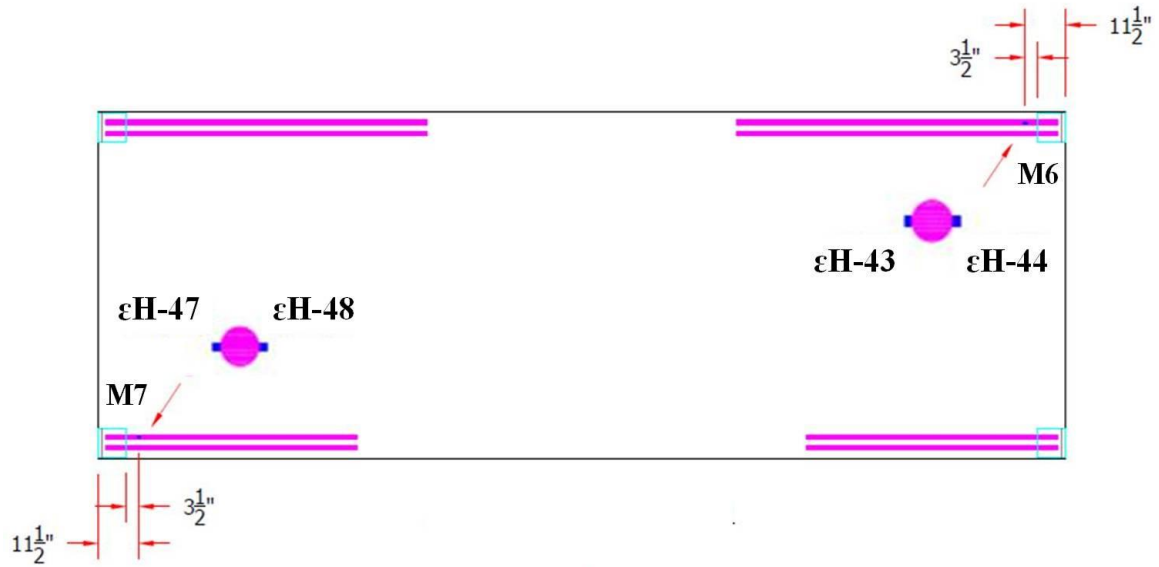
Beam-R – strain gauges on steel anchor bars at M6 and M7 plates
